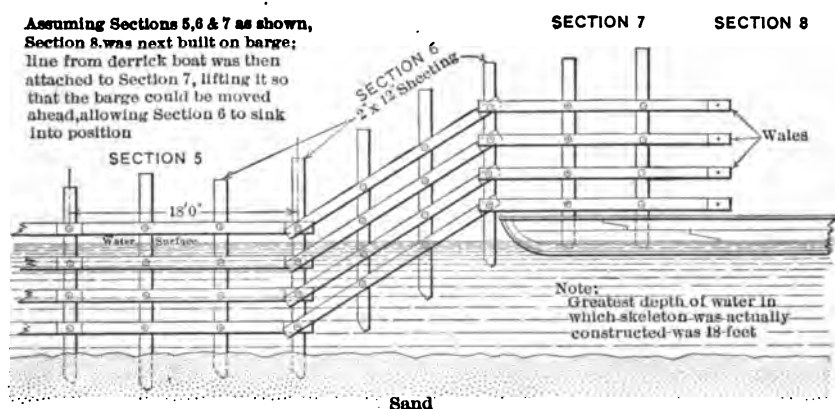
METHOD OF EXTENDING 20-FOOT COFFER-DAM. LOCK AND DAM NO. 48.
